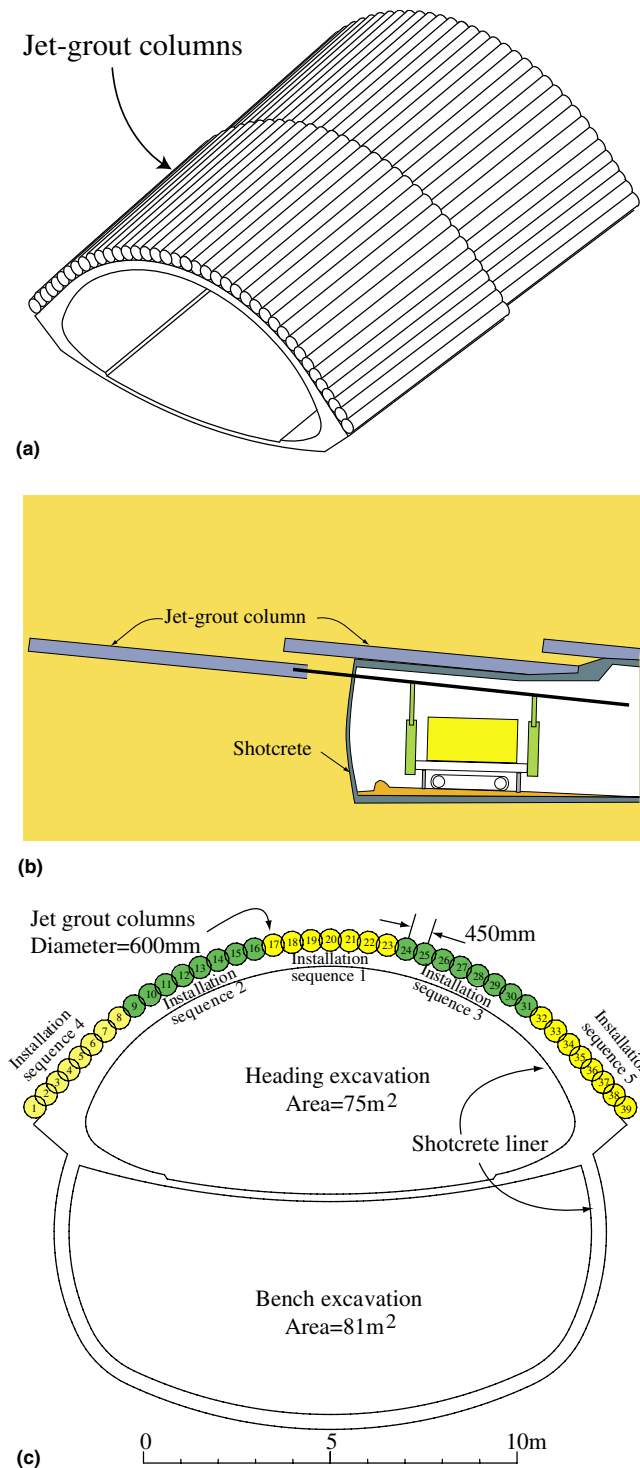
A typical jet-grout protective umbrella used for a large shallow tunnel. (a) 3D view of jet-grout umbrella; (b) typical longitudinal section showing the jet-grout columns providing the protective umbrella and (c) typical installation sequence for jet-grout column umbrella.
